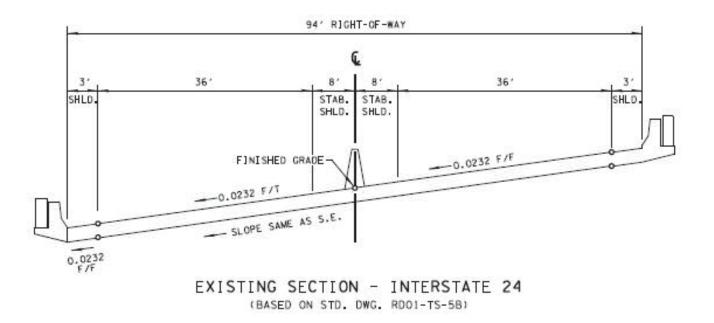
Existing Typical Section for I-24 Bridge over Germantown Road
